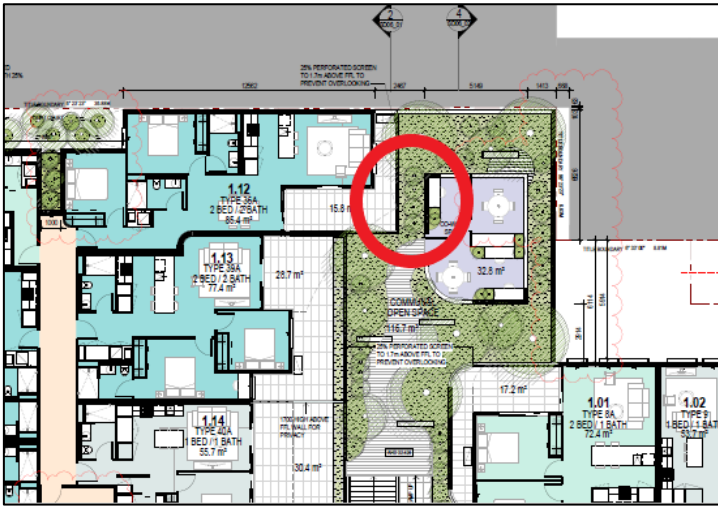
Apartment 1.12 adjacent to co-working space (SJB Architects September 2021)
